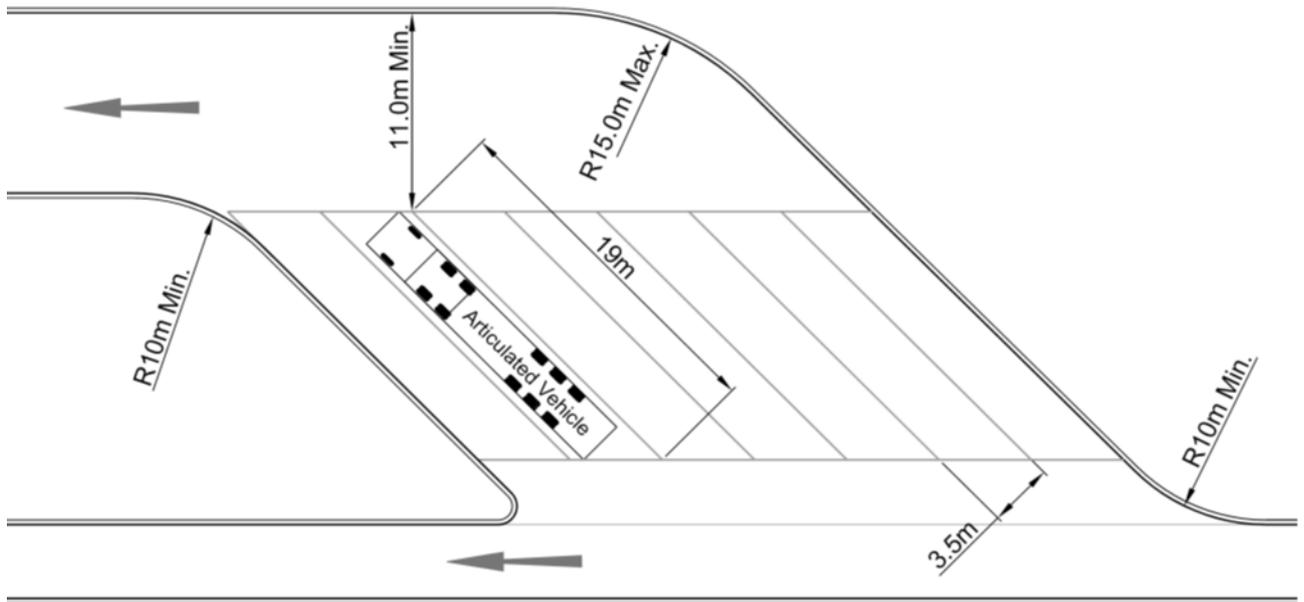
One-way HGV Parking System with Parallel Parking Bays
